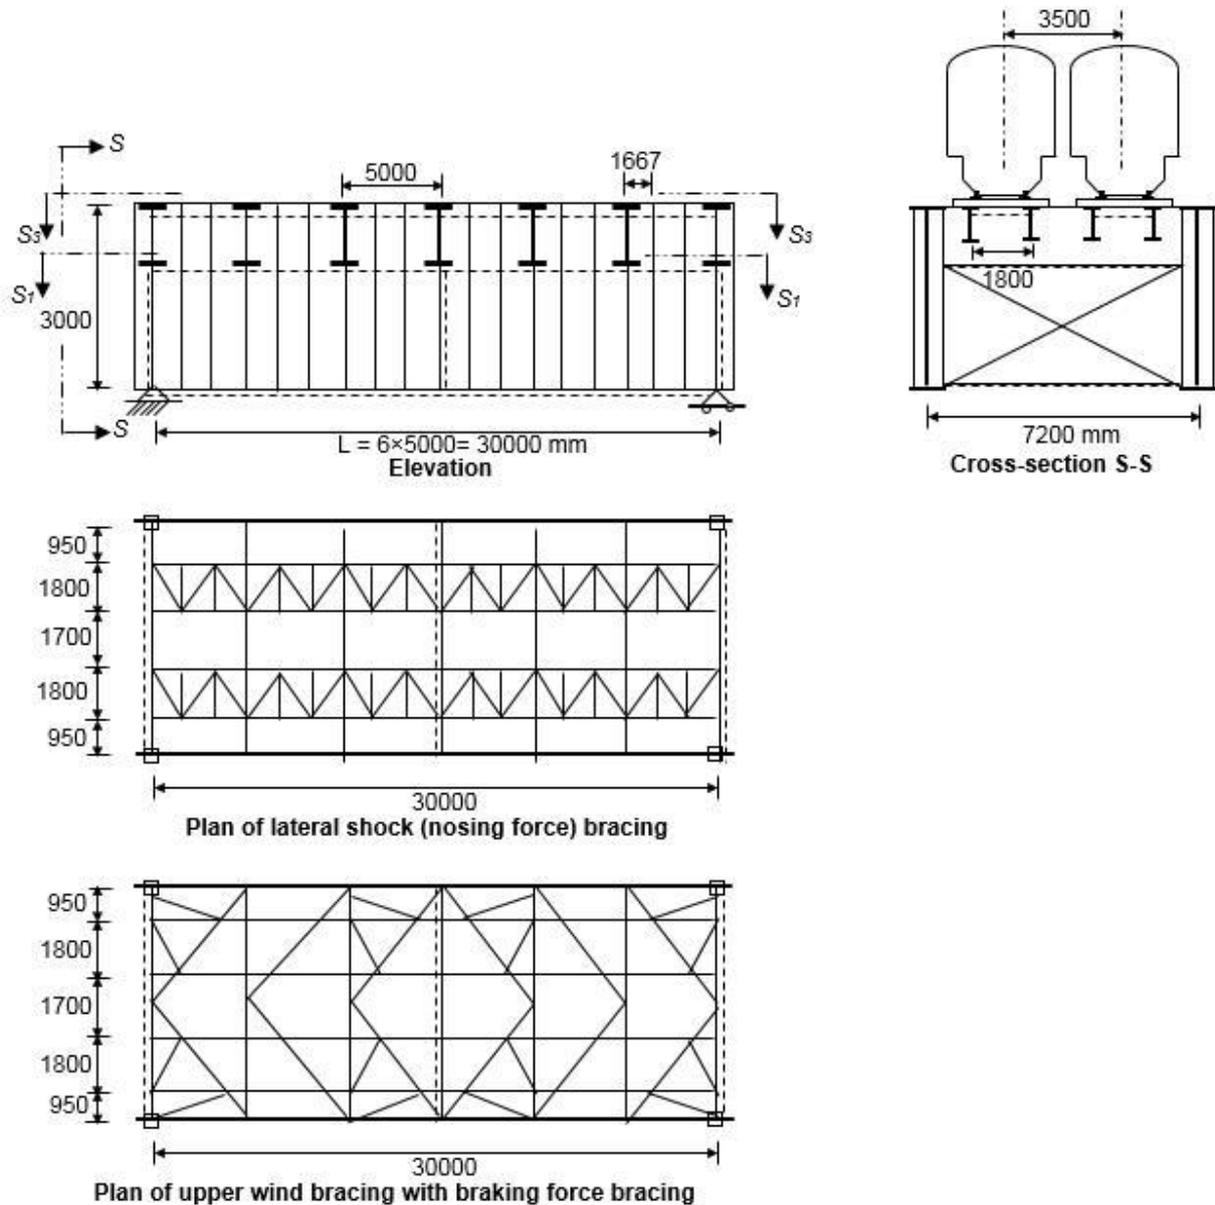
(b) General layout of the double track plate girder railway steel bridge detailed in (Ellobody 2014)
